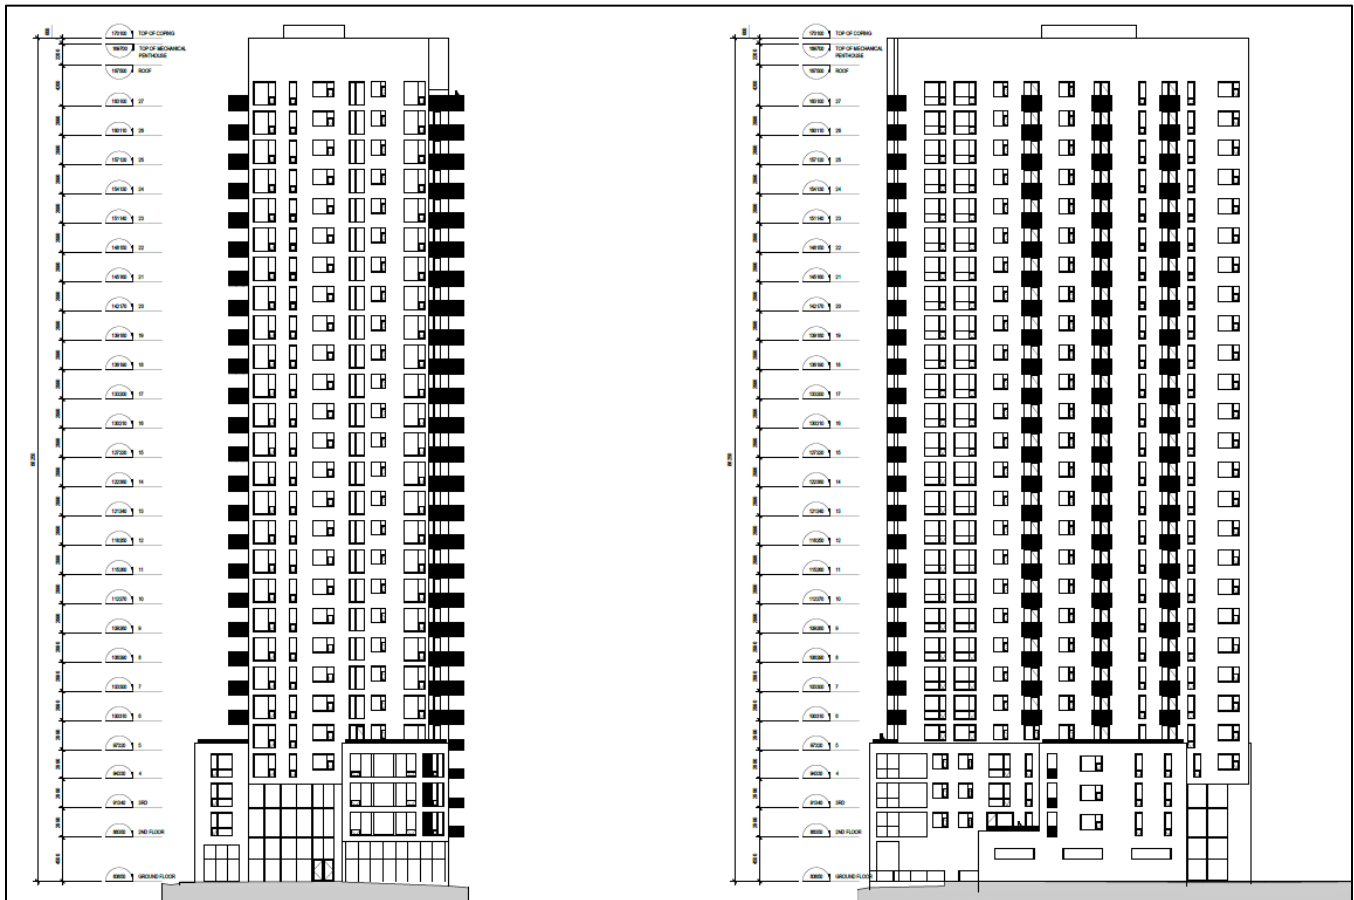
South (Carling) and West (interior side) Elevations of the Proposed Development
